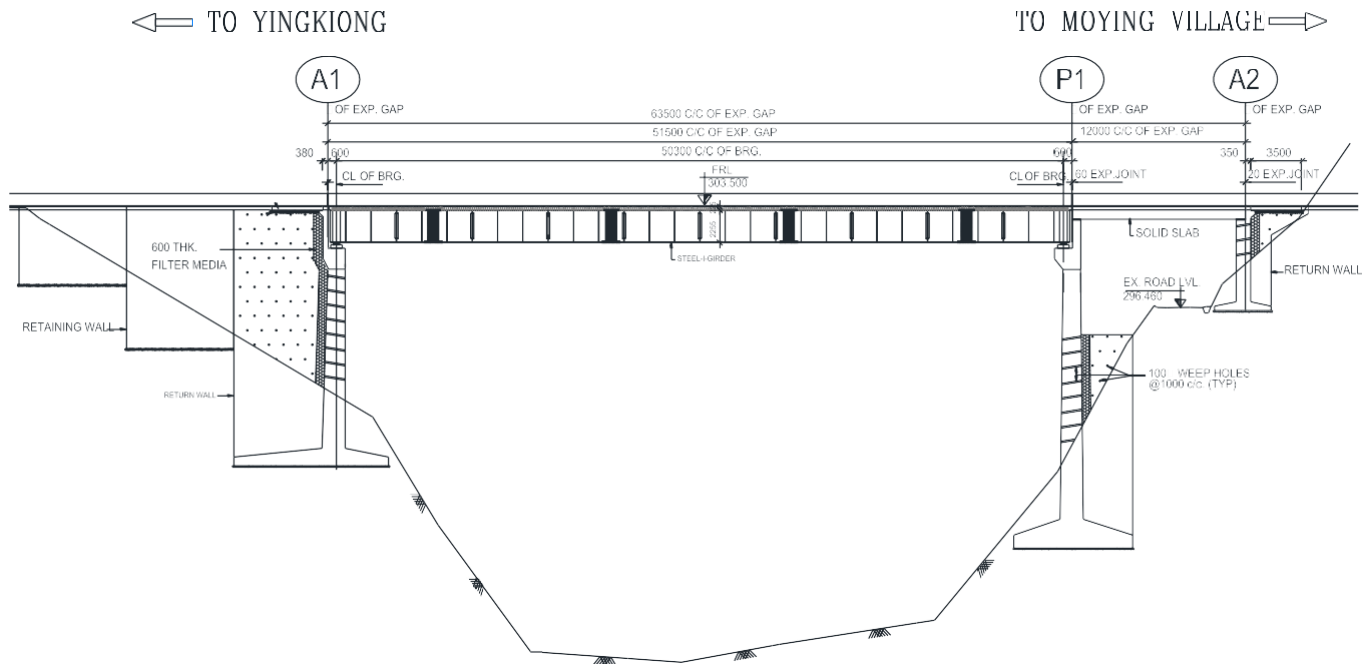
General arrangement of proposed Major Bridge at km 2+590 at Yingkiong side.
